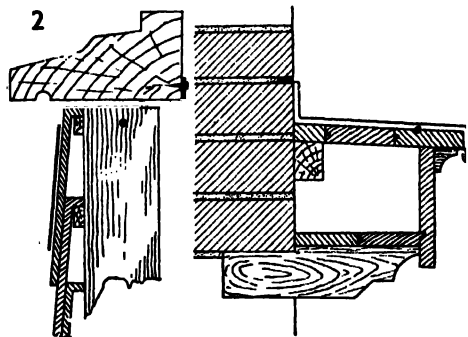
(left). Apron flashing to window sill, fixed under sill and turned down tiles. Fig. 3. Horizontal self-flashed apron fixed to wood door-hood or narrow cornice to shop front.
